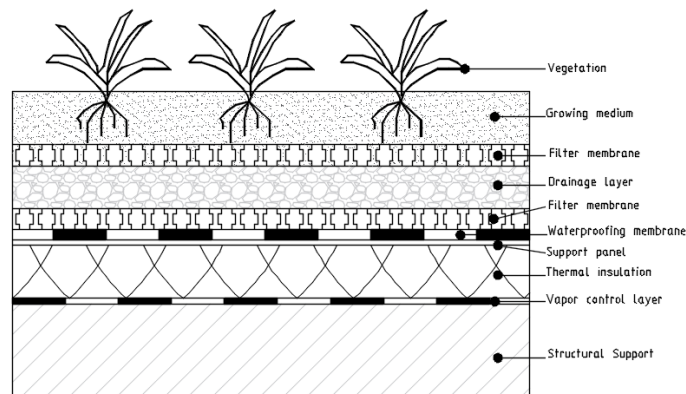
Detail of an intensive green roof as a natural cladding technique to cool the building
